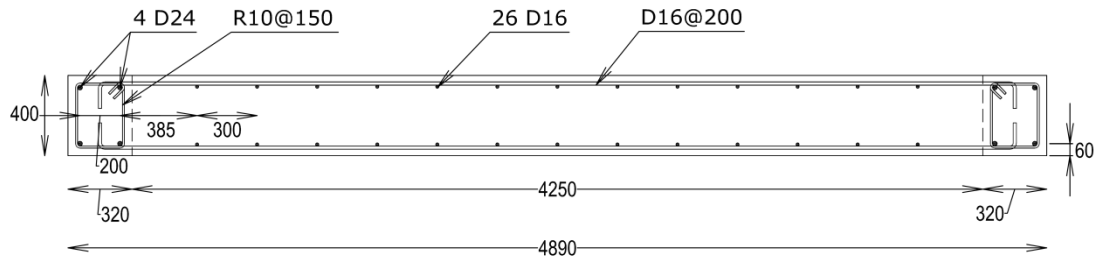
Details of the wall used for the parametric study on axial load ratio
